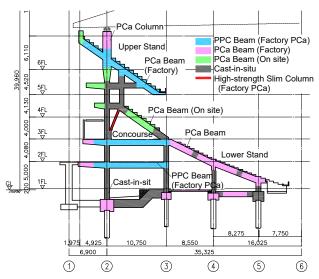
Home-stand framing elevation (showing the high-strength slim columns)
